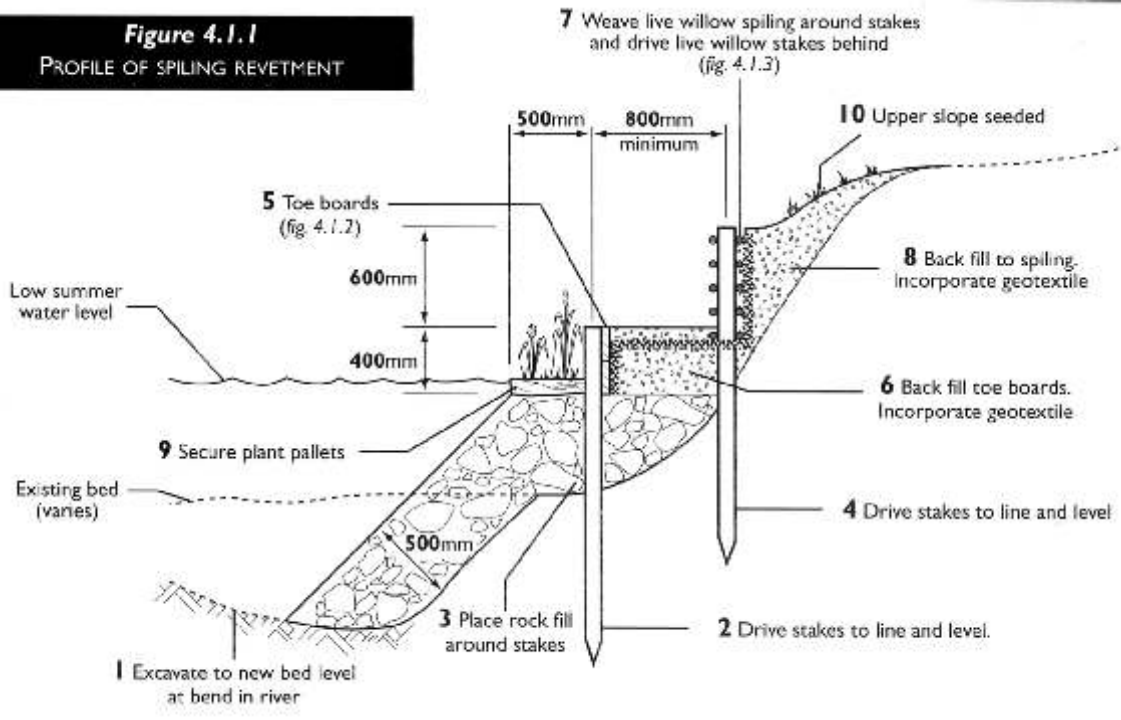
Profile and construction of a Willow Spiling Revetment (RRC, 1999)
